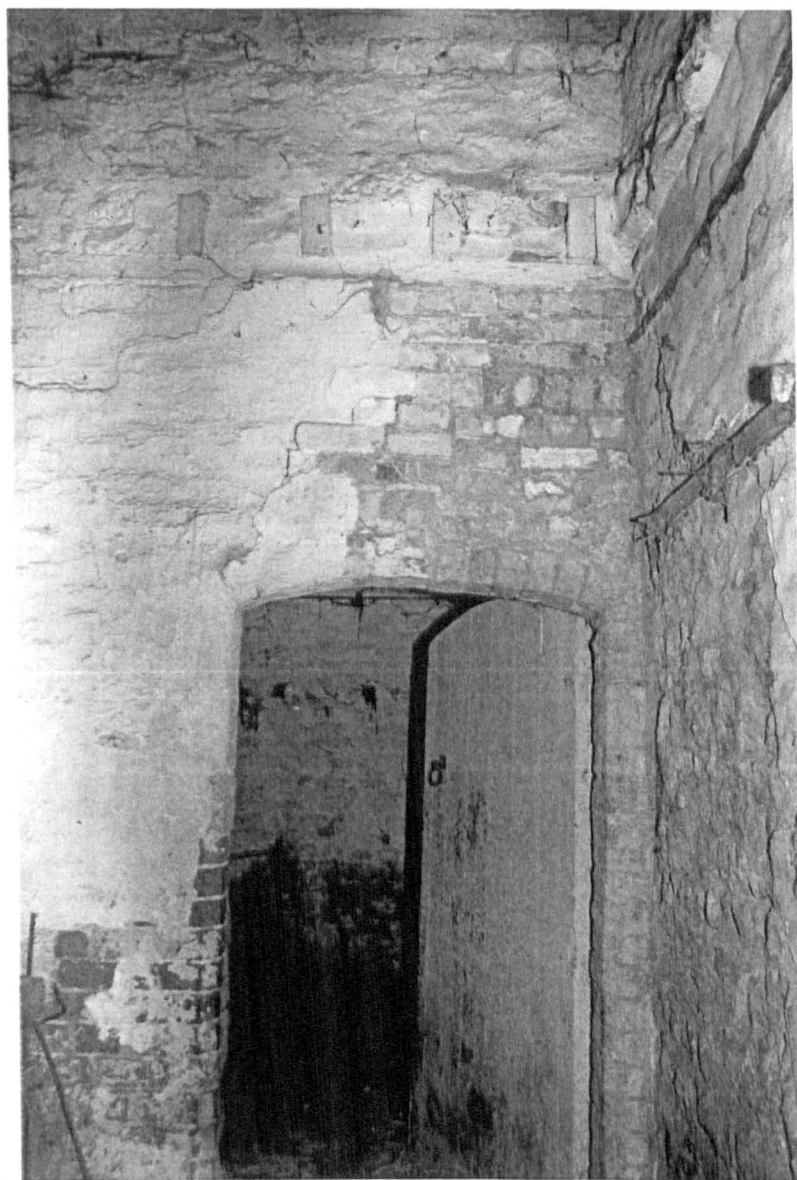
Stable interior with evidence of two phases of construction (*in brickwork above door*), Hall Farm, South Rauceby
